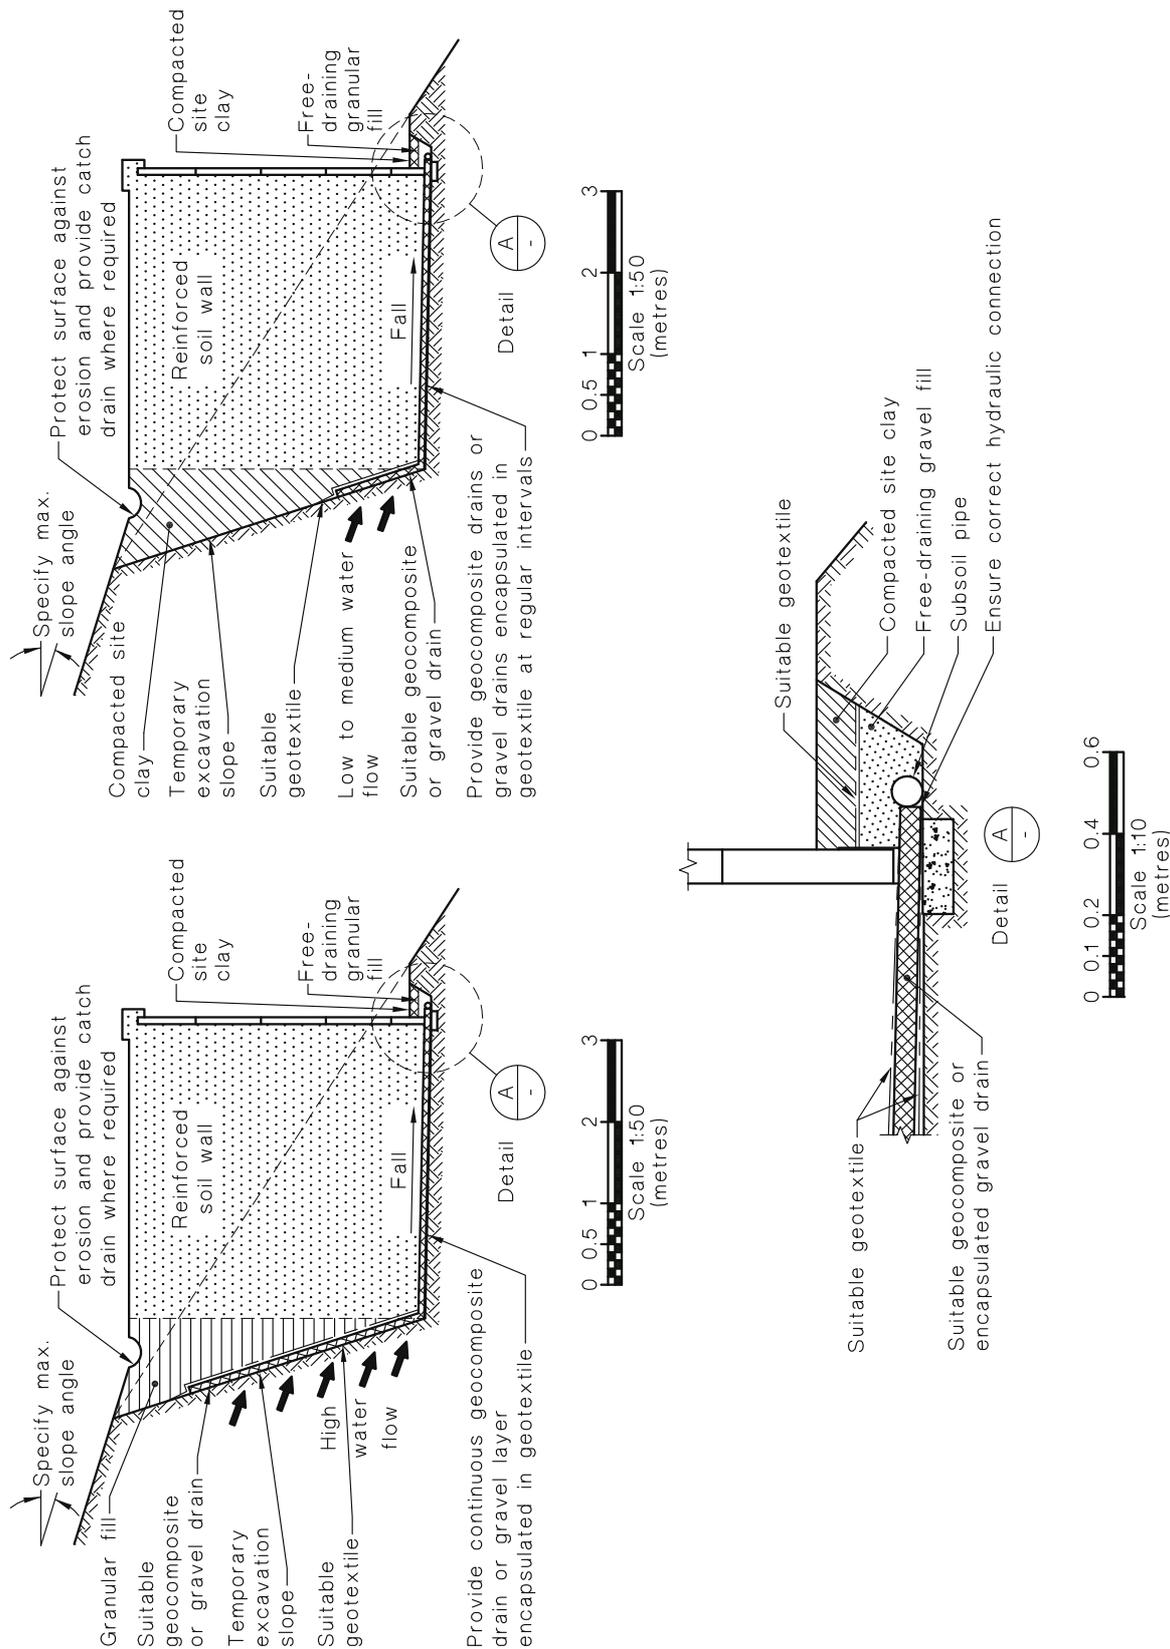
TYPICAL SUBSOIL DRAINAGE FOR REINFORCED SOIL WALLS
